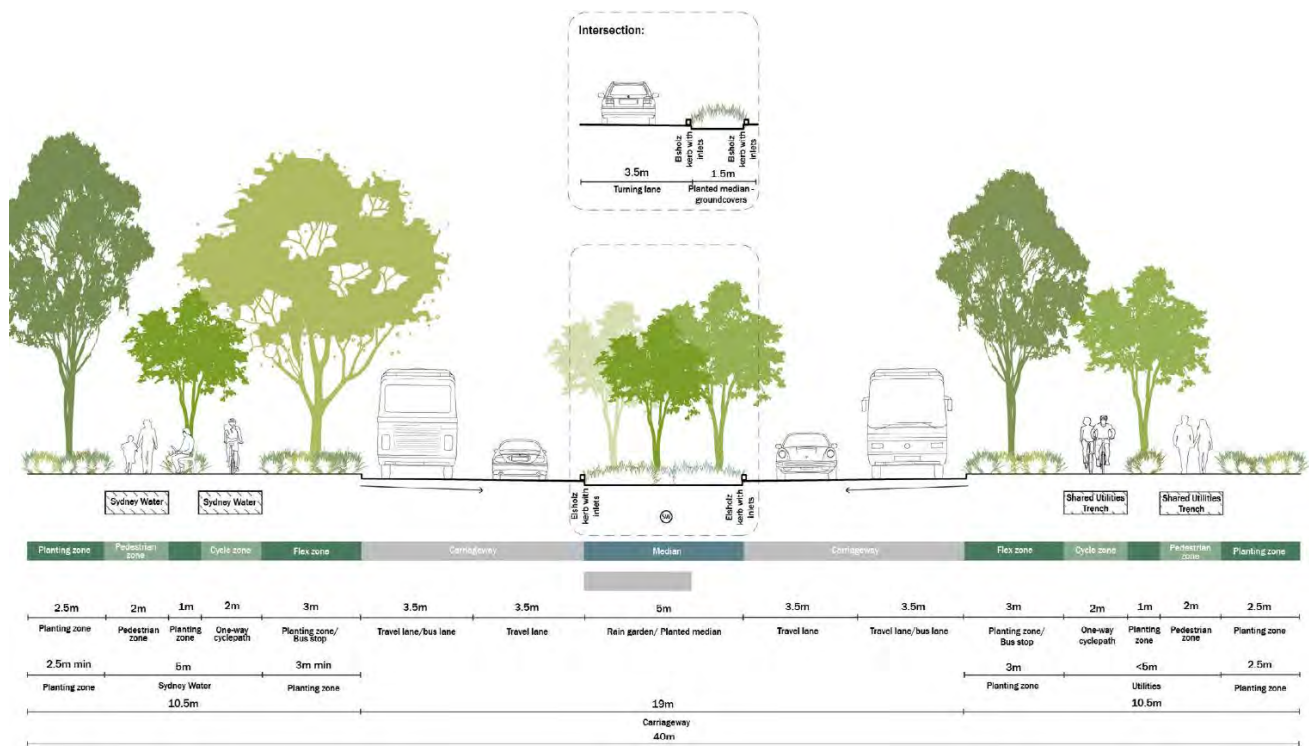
Primary Arterial Road (Rapid Bus) – Typical arrangement
